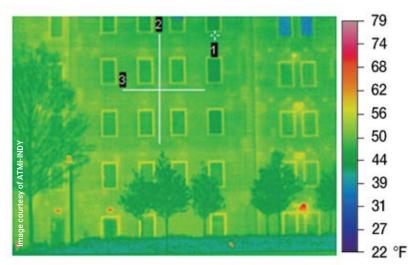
In this thermal image of a precast building, the only hot spots are exterior lights.
